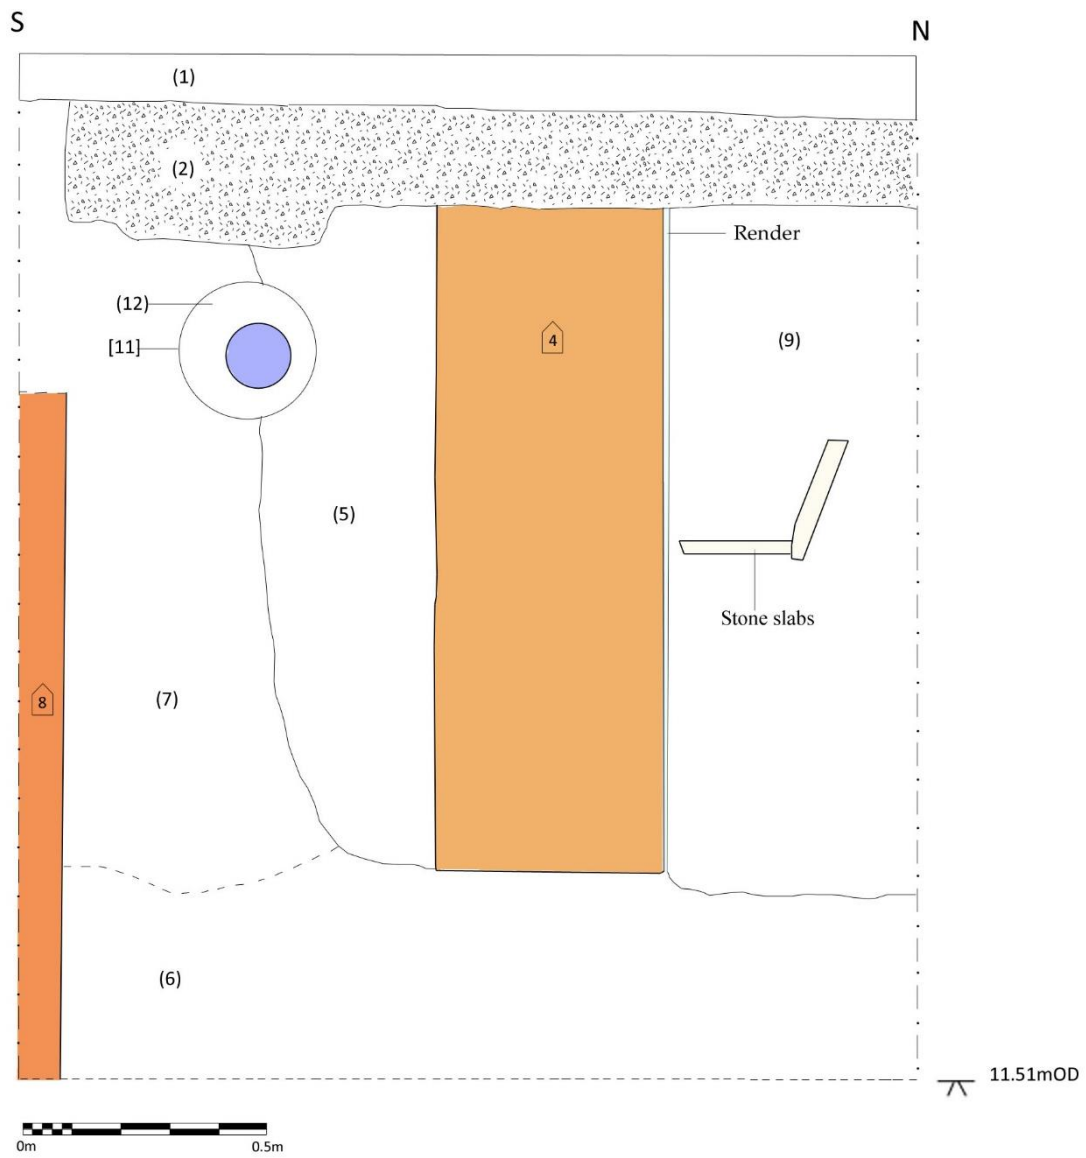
Drop Shaft 1. East facing section. Original drawn at 1:10.
